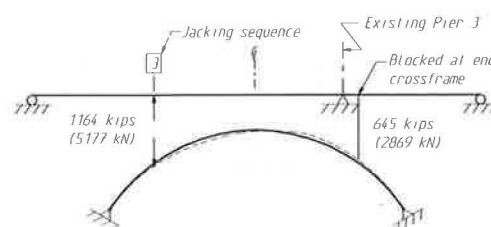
Jacking Sequence 3—end crossframe jacking.
